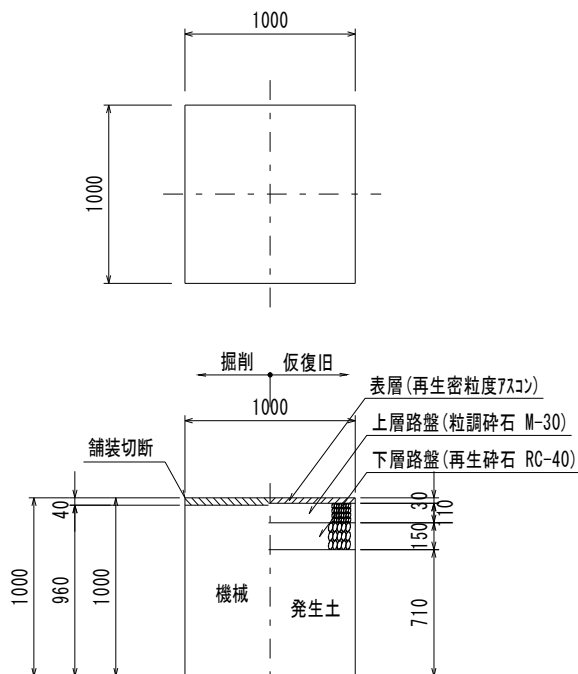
consists of two diagrams: a plan view and a cross-sectional view.
